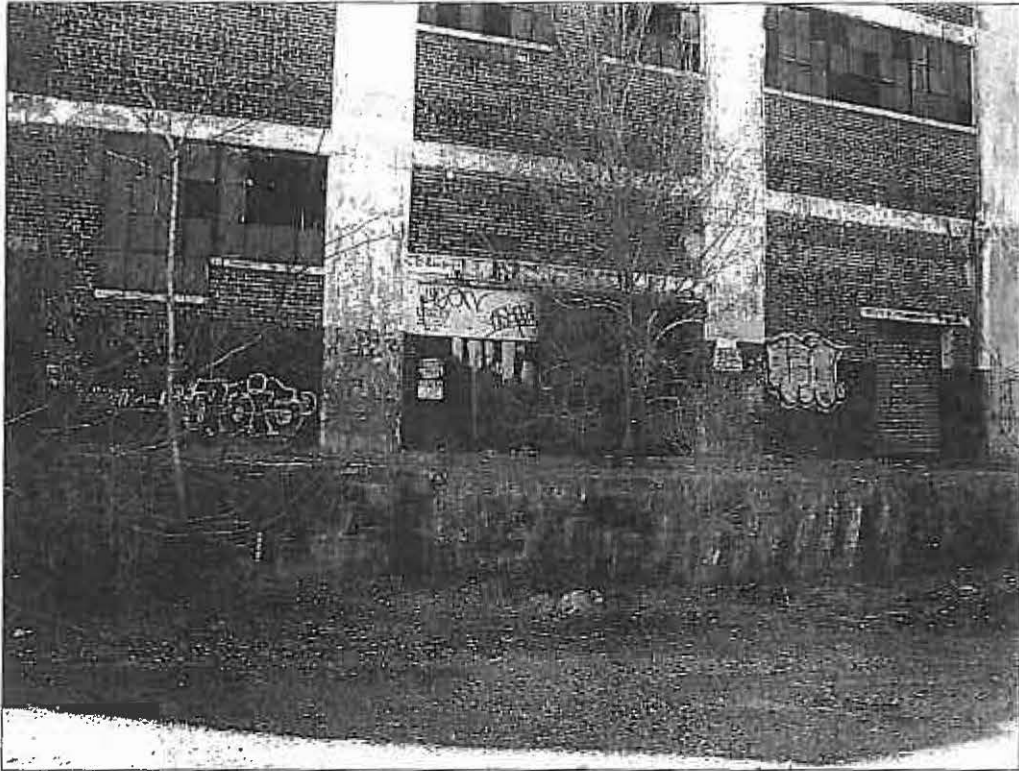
Looking southwest at exterior of Building No. 12 and loading dock area (AOC F-1).
